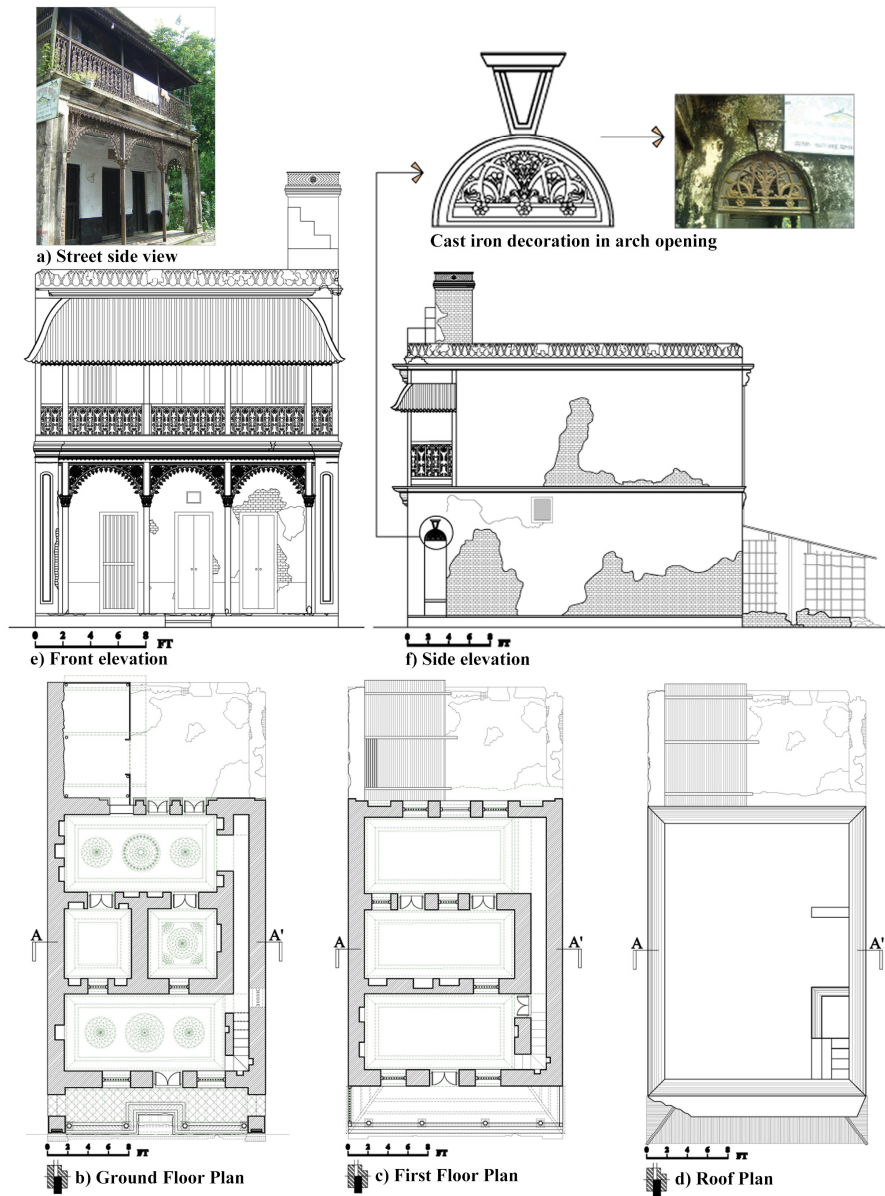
a) Street side view, b) Ground floor plan, c) First floor plan, d) Roof plan, e) Front elevation, and f) Side elevation of the Building no. - 31.
